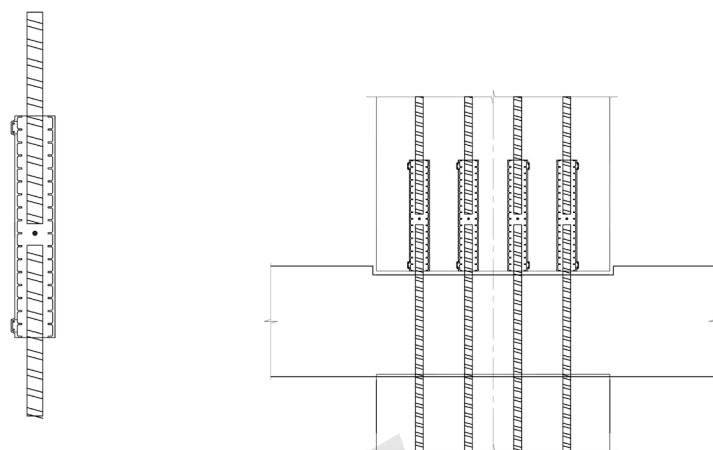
Fully grouted sleeve, used at joint between columns and floor , in this case the coupler is cast into the bottom of the column.
